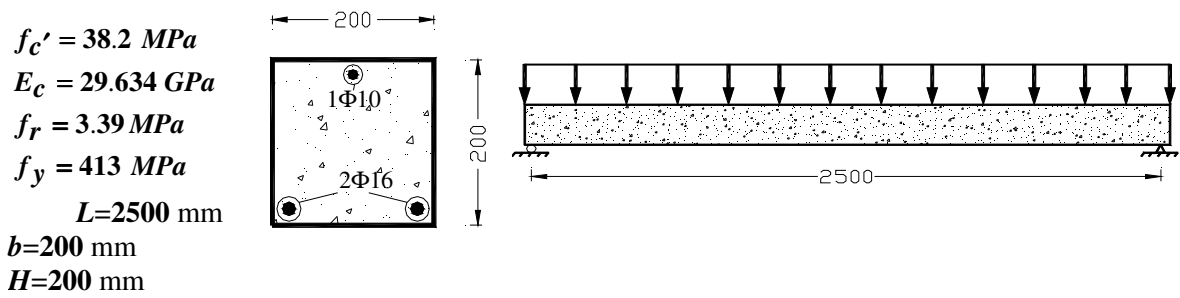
Details of a reinforced concrete simply supported beam under distributed load with $(L/H=12.5)$ (Al-Zaid, et al.)
